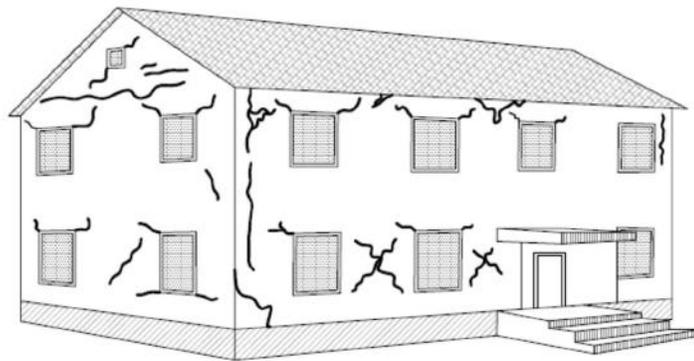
Damage pattern characteristic for unreinforced masonry buildings (adapted from Grunthal, 1998).
